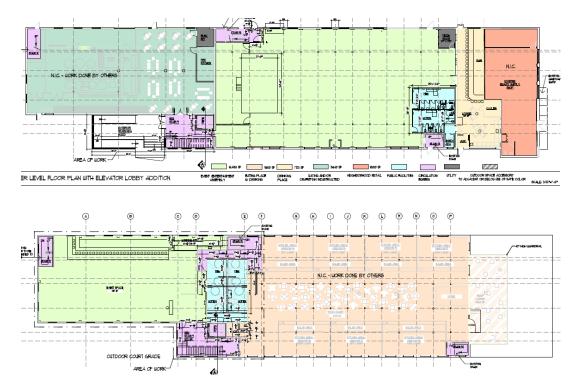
Proposed and existing uses layout – Lifecare Design 2022
